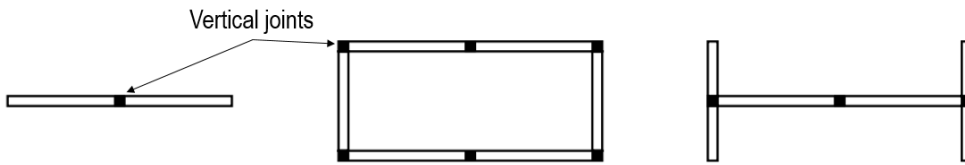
Plane view of precast shear walls with vertical joints [2]
